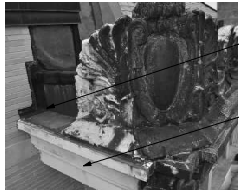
DETAIL OF CRESTING SEAM WITH PRIOR REPAIRS
